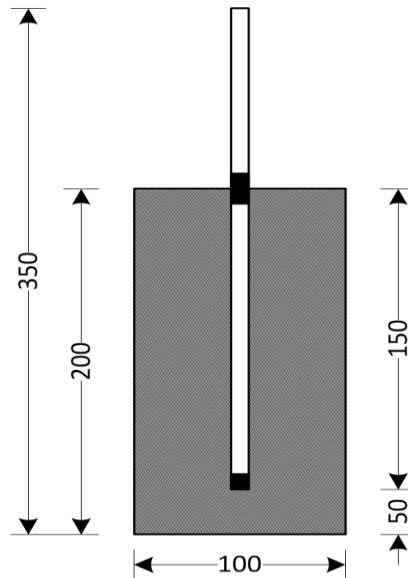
Specimen details for Stage-II with Reduced Dimension
